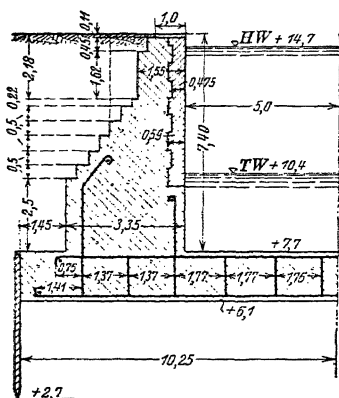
Cross-section through chamber of barge train lock at Meppen, Dortmund-Ems Canal
